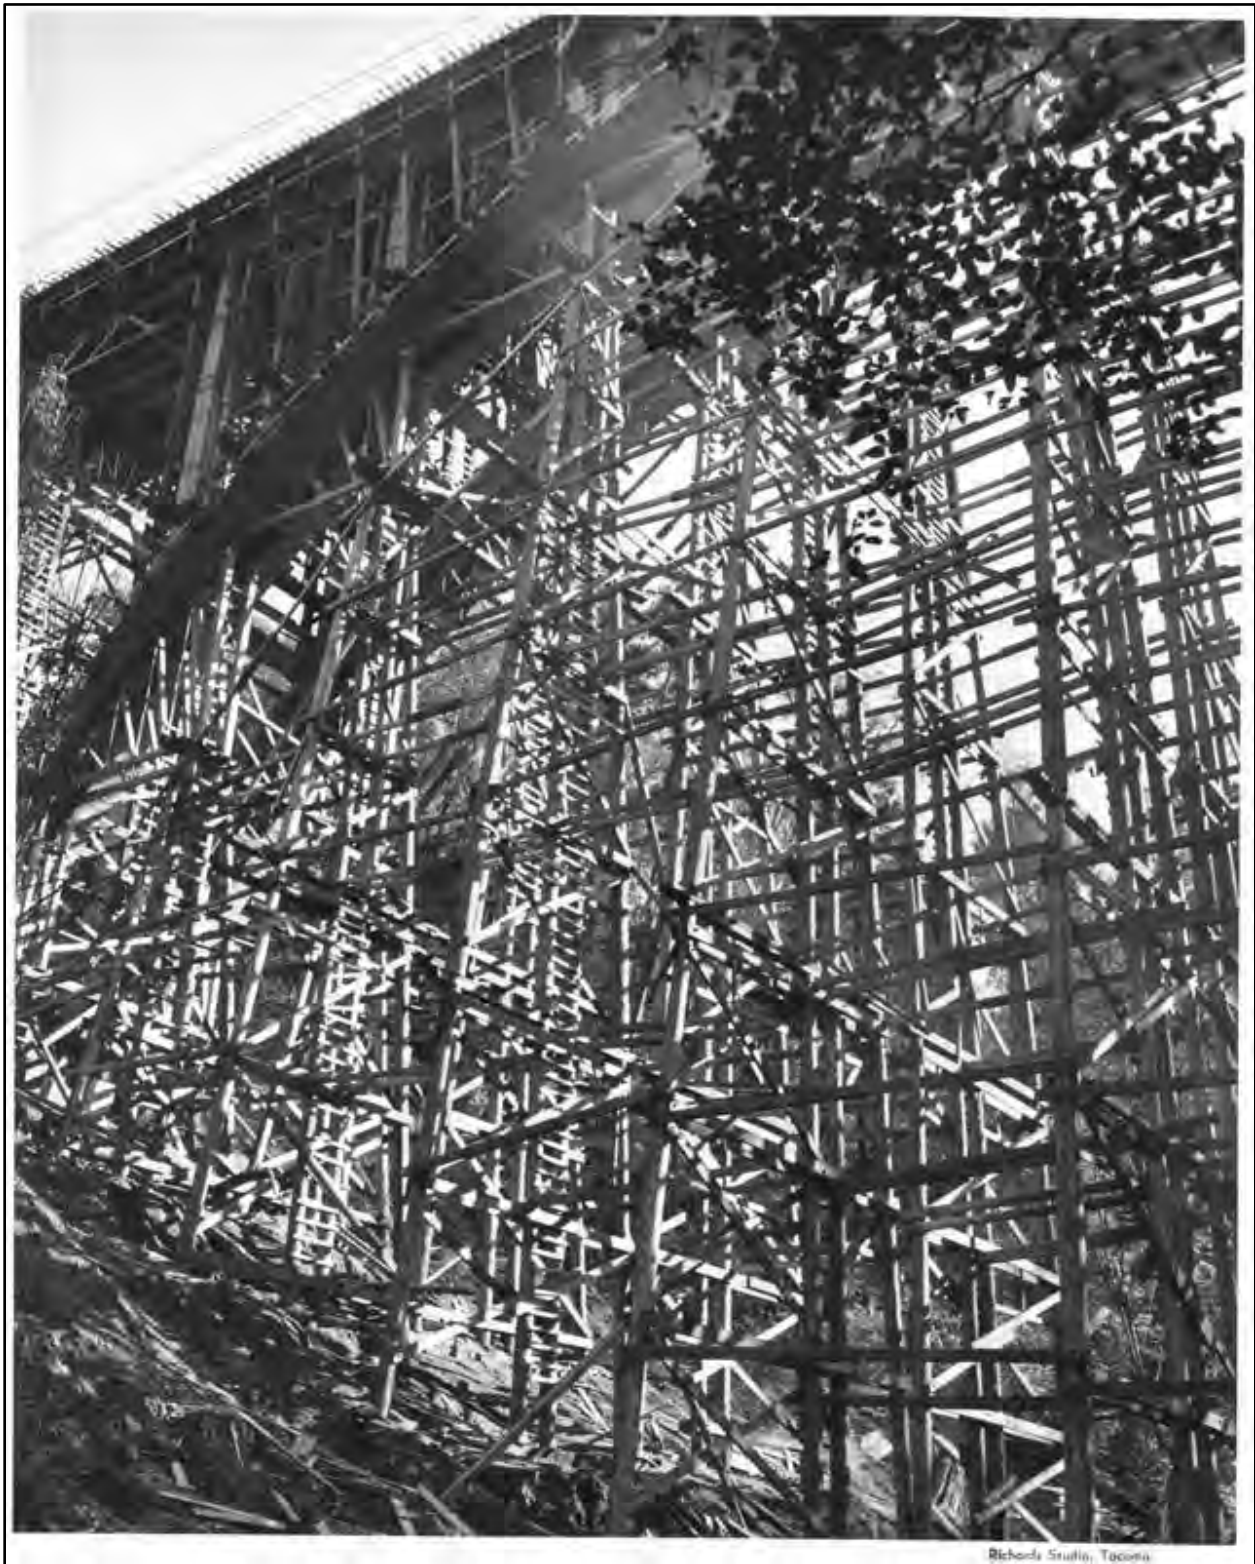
The in-construction phase below East 34th Street Bridge – Pacific to A Street circa 1935 (Tacoma Public Library 2024).
